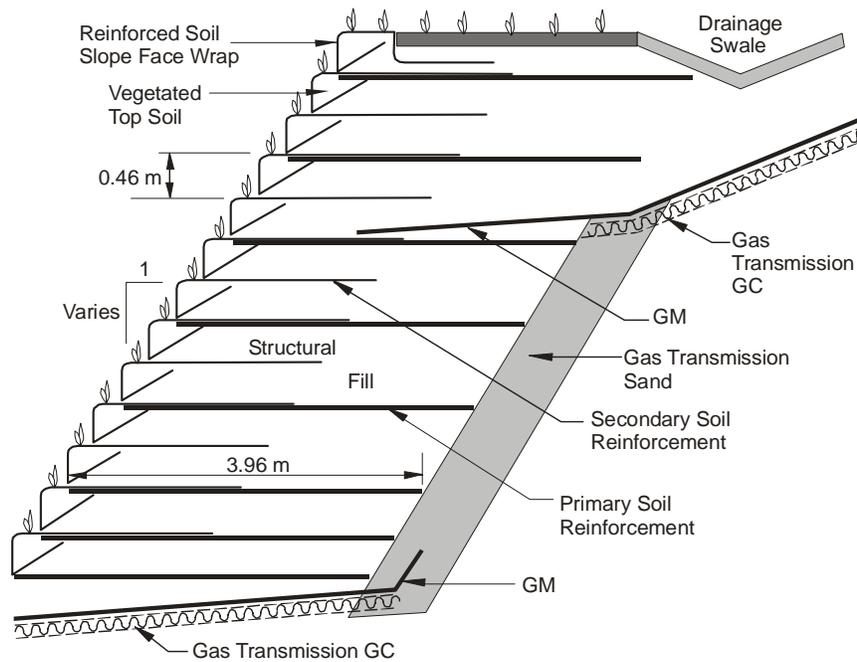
Detail of Reinforced Soil Slope Cover System Used on Steeper Slope Sections of a Hazardous Waste Landfill Cover System (modified from Cargill and Olen, 1997, 1998).
